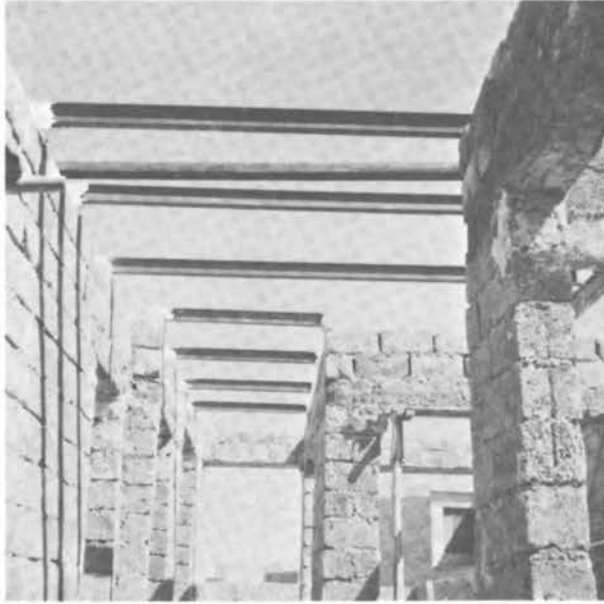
A Typical Building with the Concrete Block Walls and SBABA Roofing System in Shīrāz.
